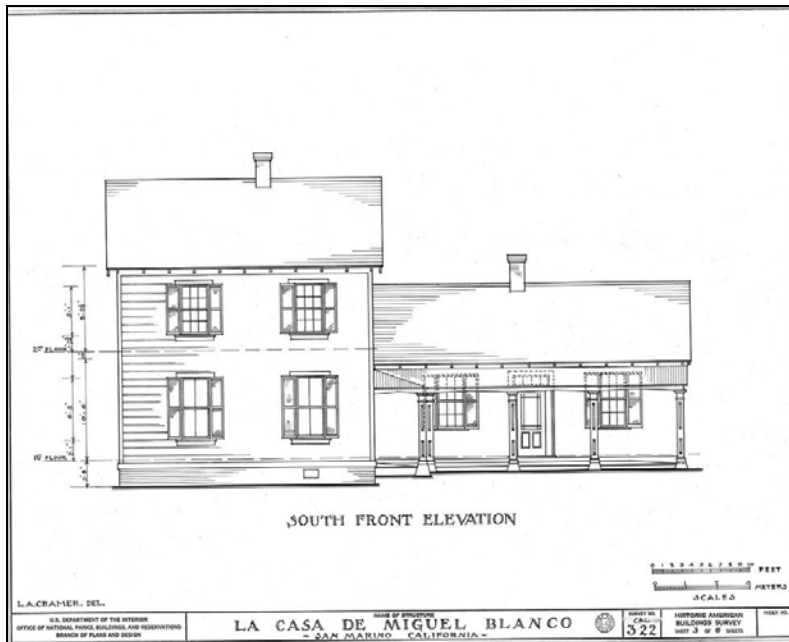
Drawing of "South Front Elevation" (Historic American Building Survey, 1936)
